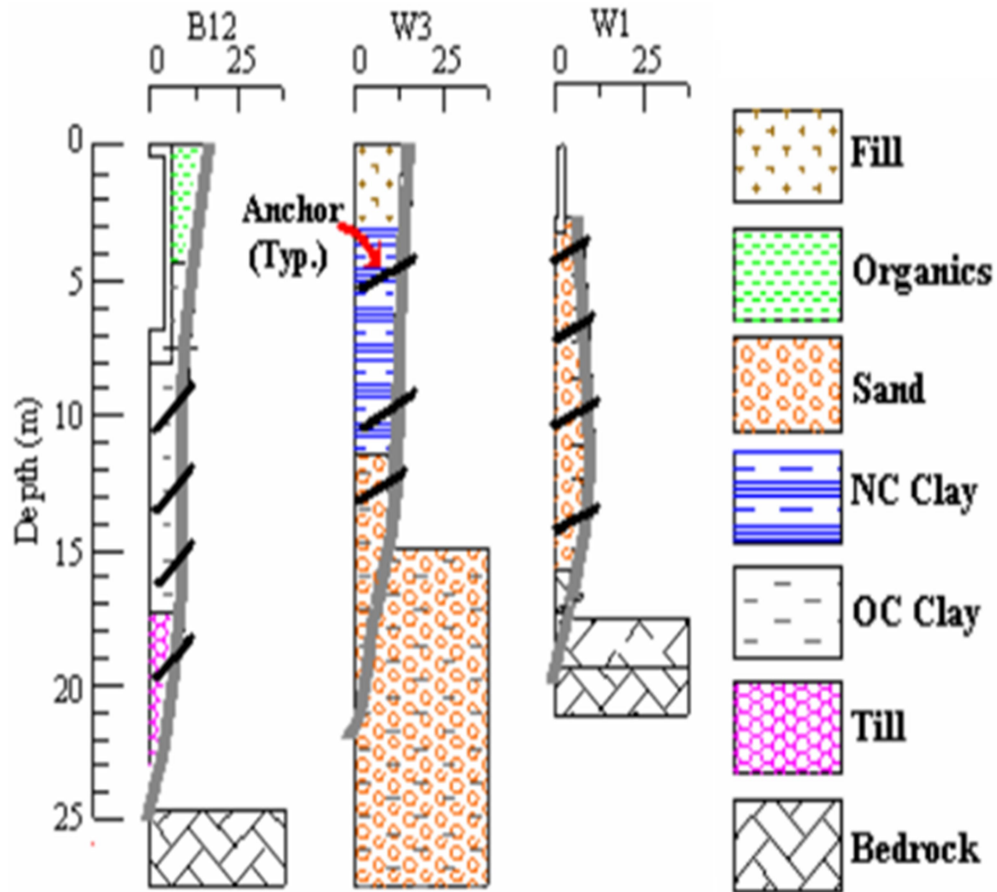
Typical Section and Wall Deformations (mm) of Anchor Supported Keyed Wall Excavations (Konstantakos 2008 [17])
